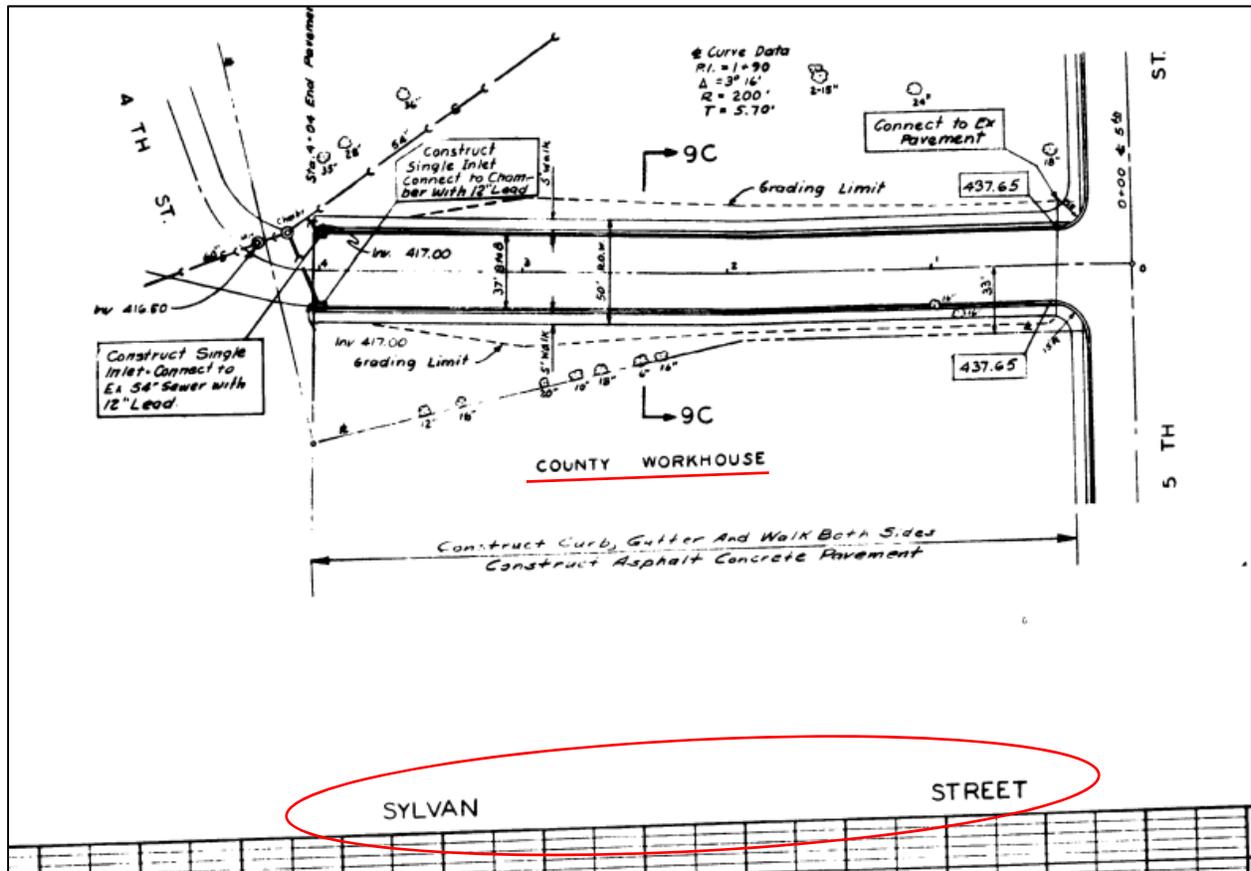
MDHA East Nashville, Contract T, 1962 Urban Renewal Plans, As Built Plans – Sylvan Street. Source: Metro Nashville Public Works.
